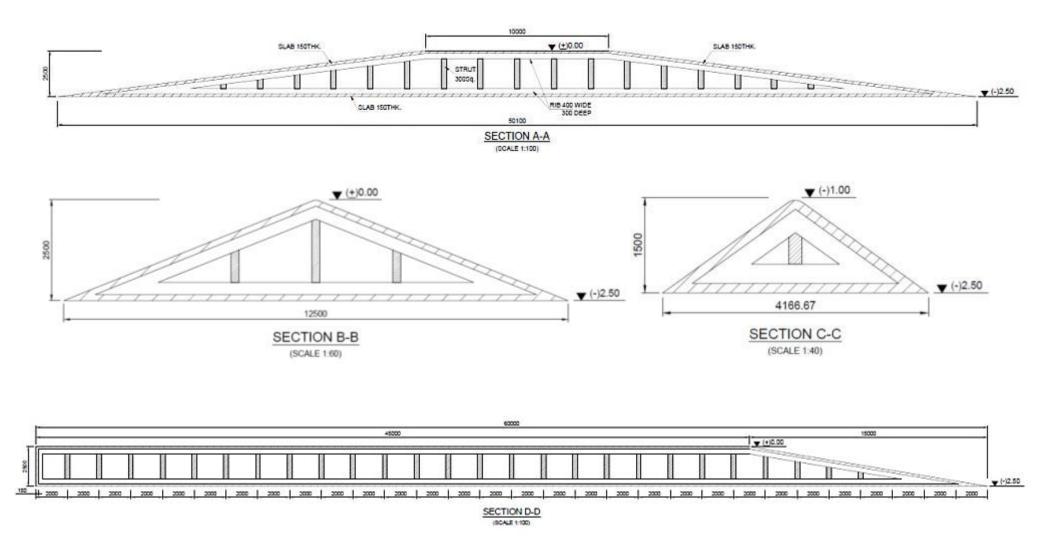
Concrete caisson (150 mm wall thickness) cross-sections (refer layout plan in Figure 3.8 for the cross-section locations)
